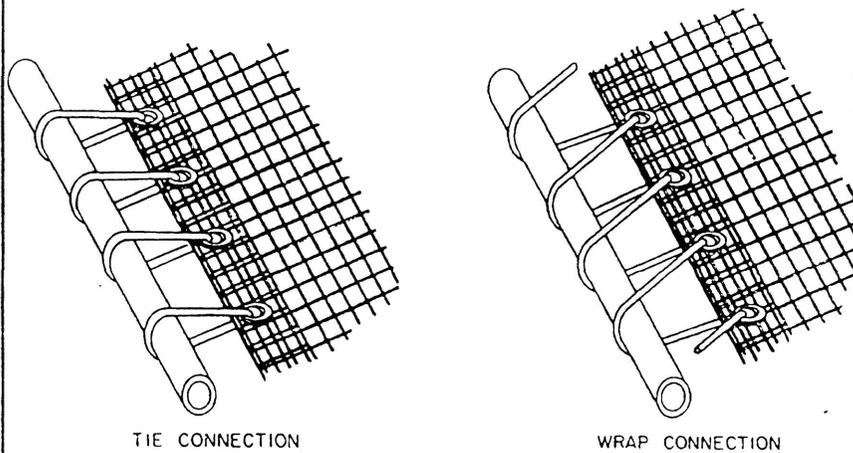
CABLE, PIPE, OR REBAR CONSTRUCTION
